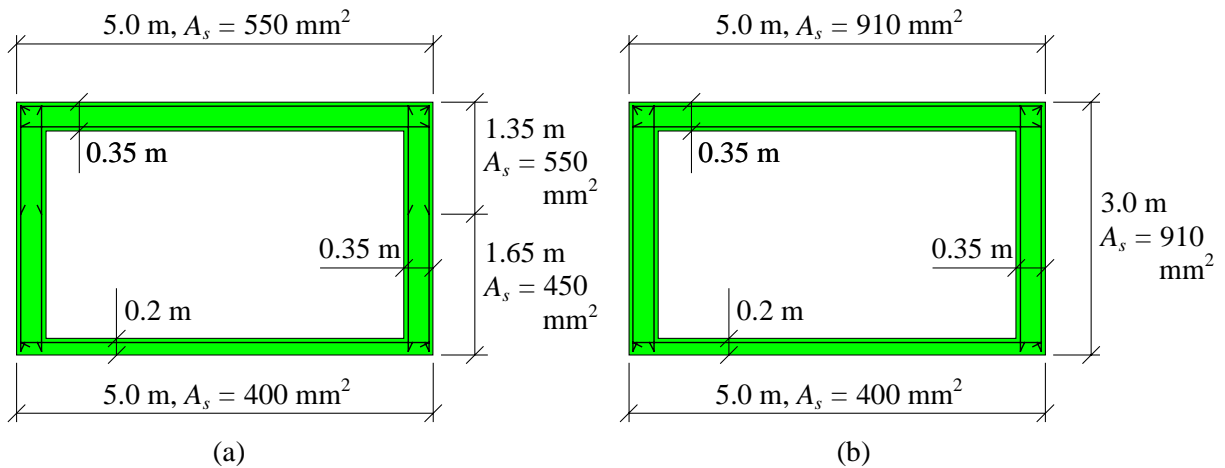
Dimensions and reinforcement detailing for civil defence shelter subjected to: (a) weapon load; (b) impact load. The reinforcement centre is positioned 30 mm from the concrete edge.
